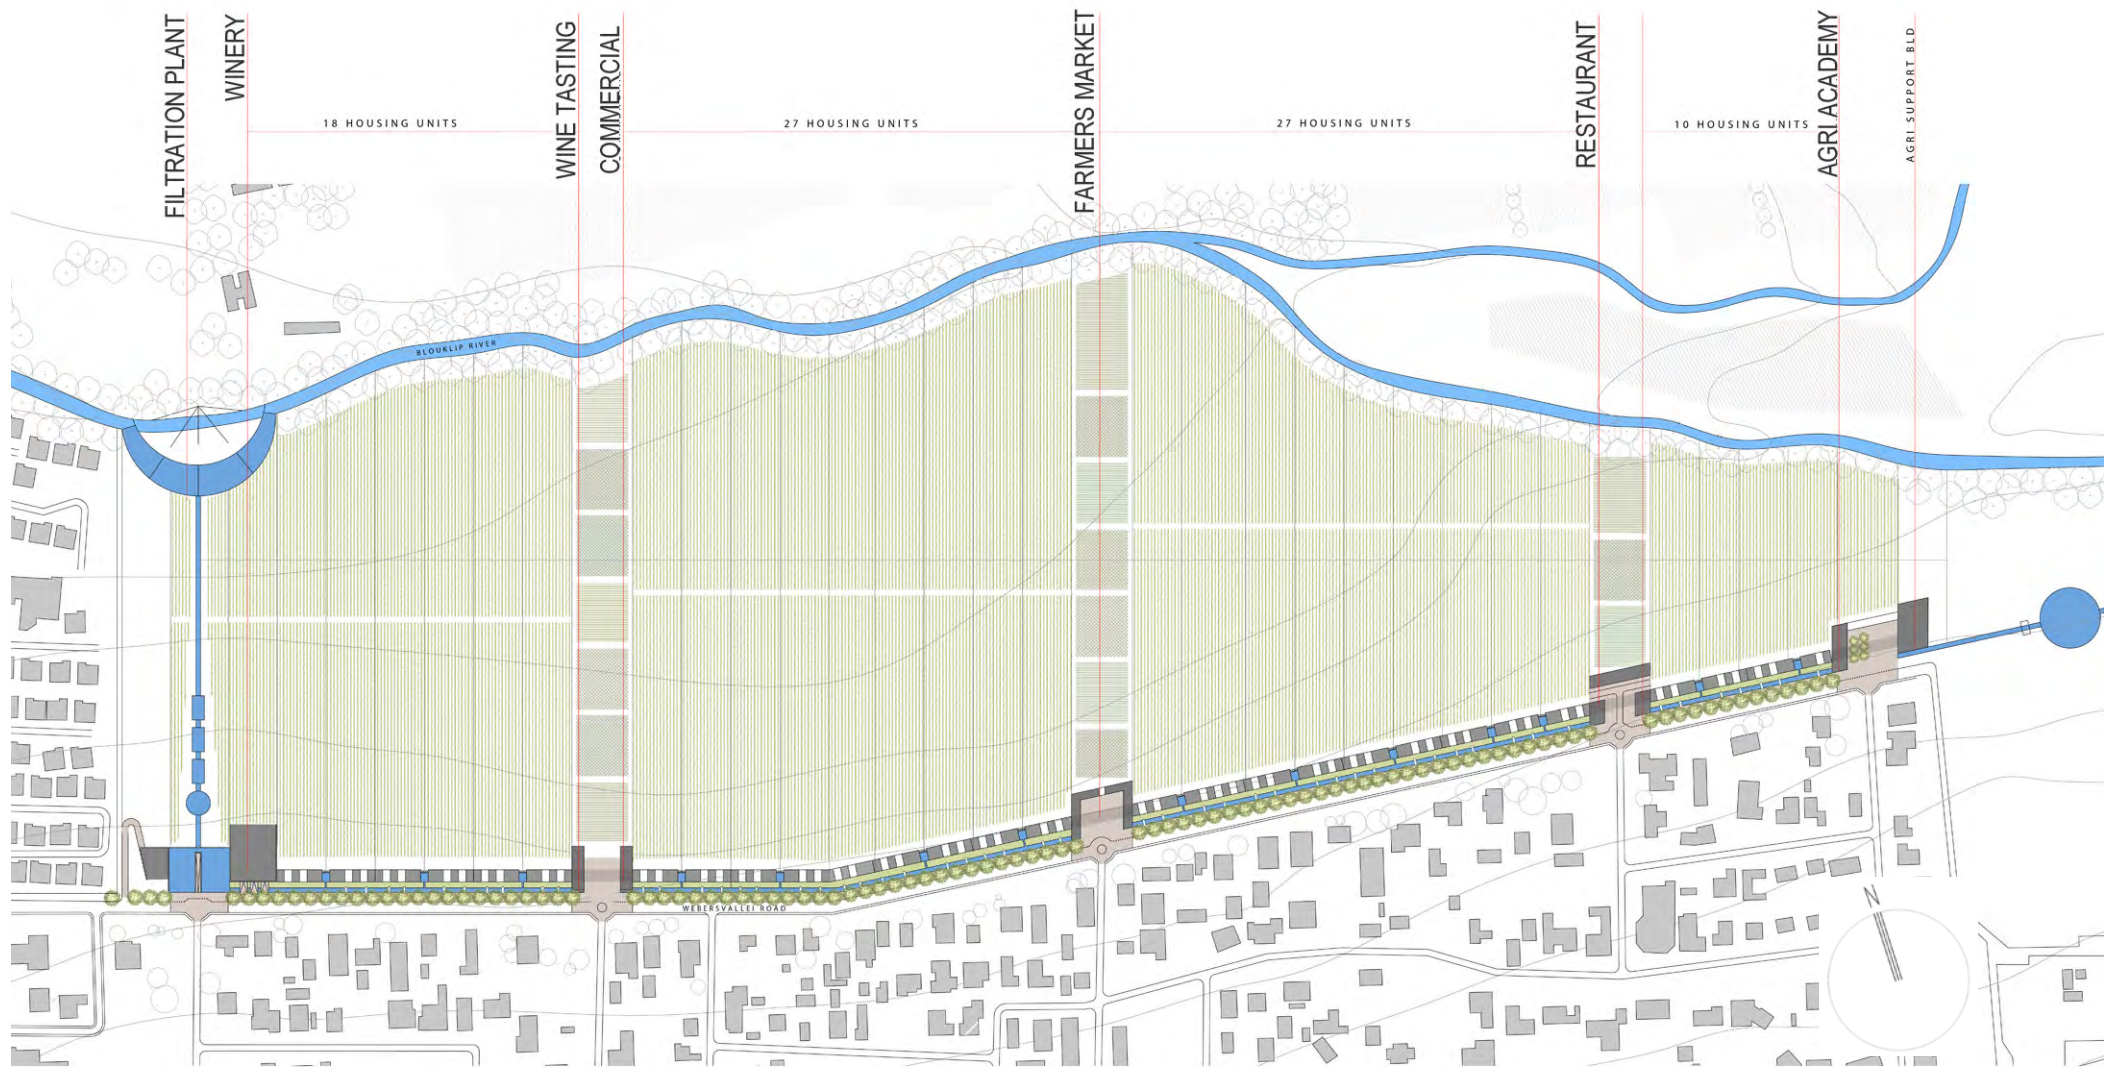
(ABOVE): Site plan of the urban sketch design. (Author)
